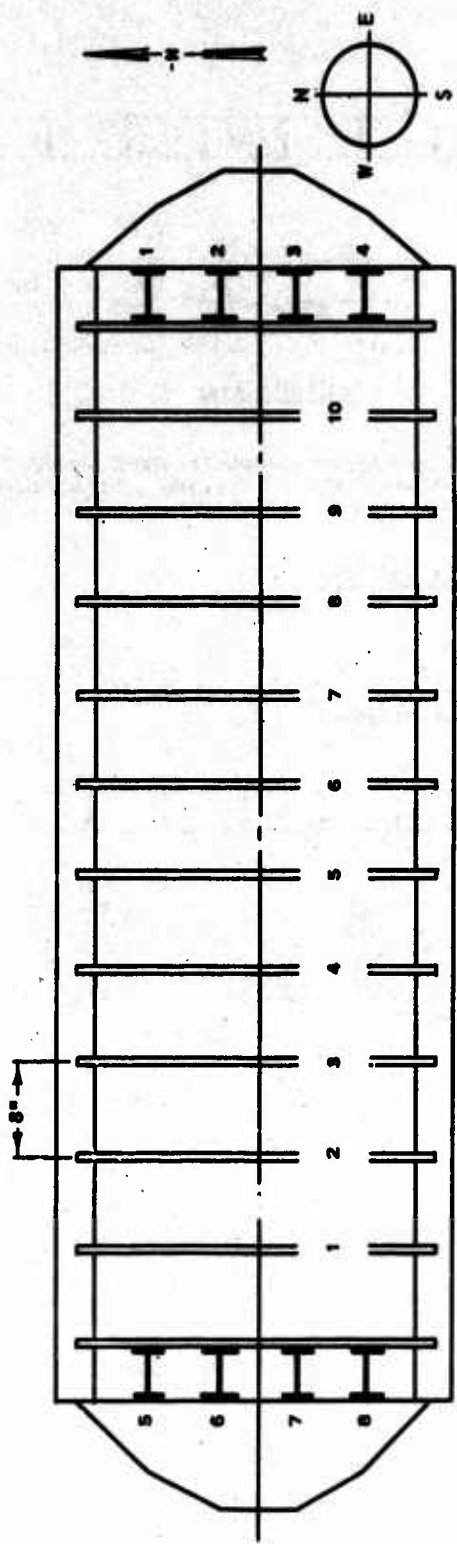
Fully instrumented structure prior to placing timber lagging, Preshot 3.
